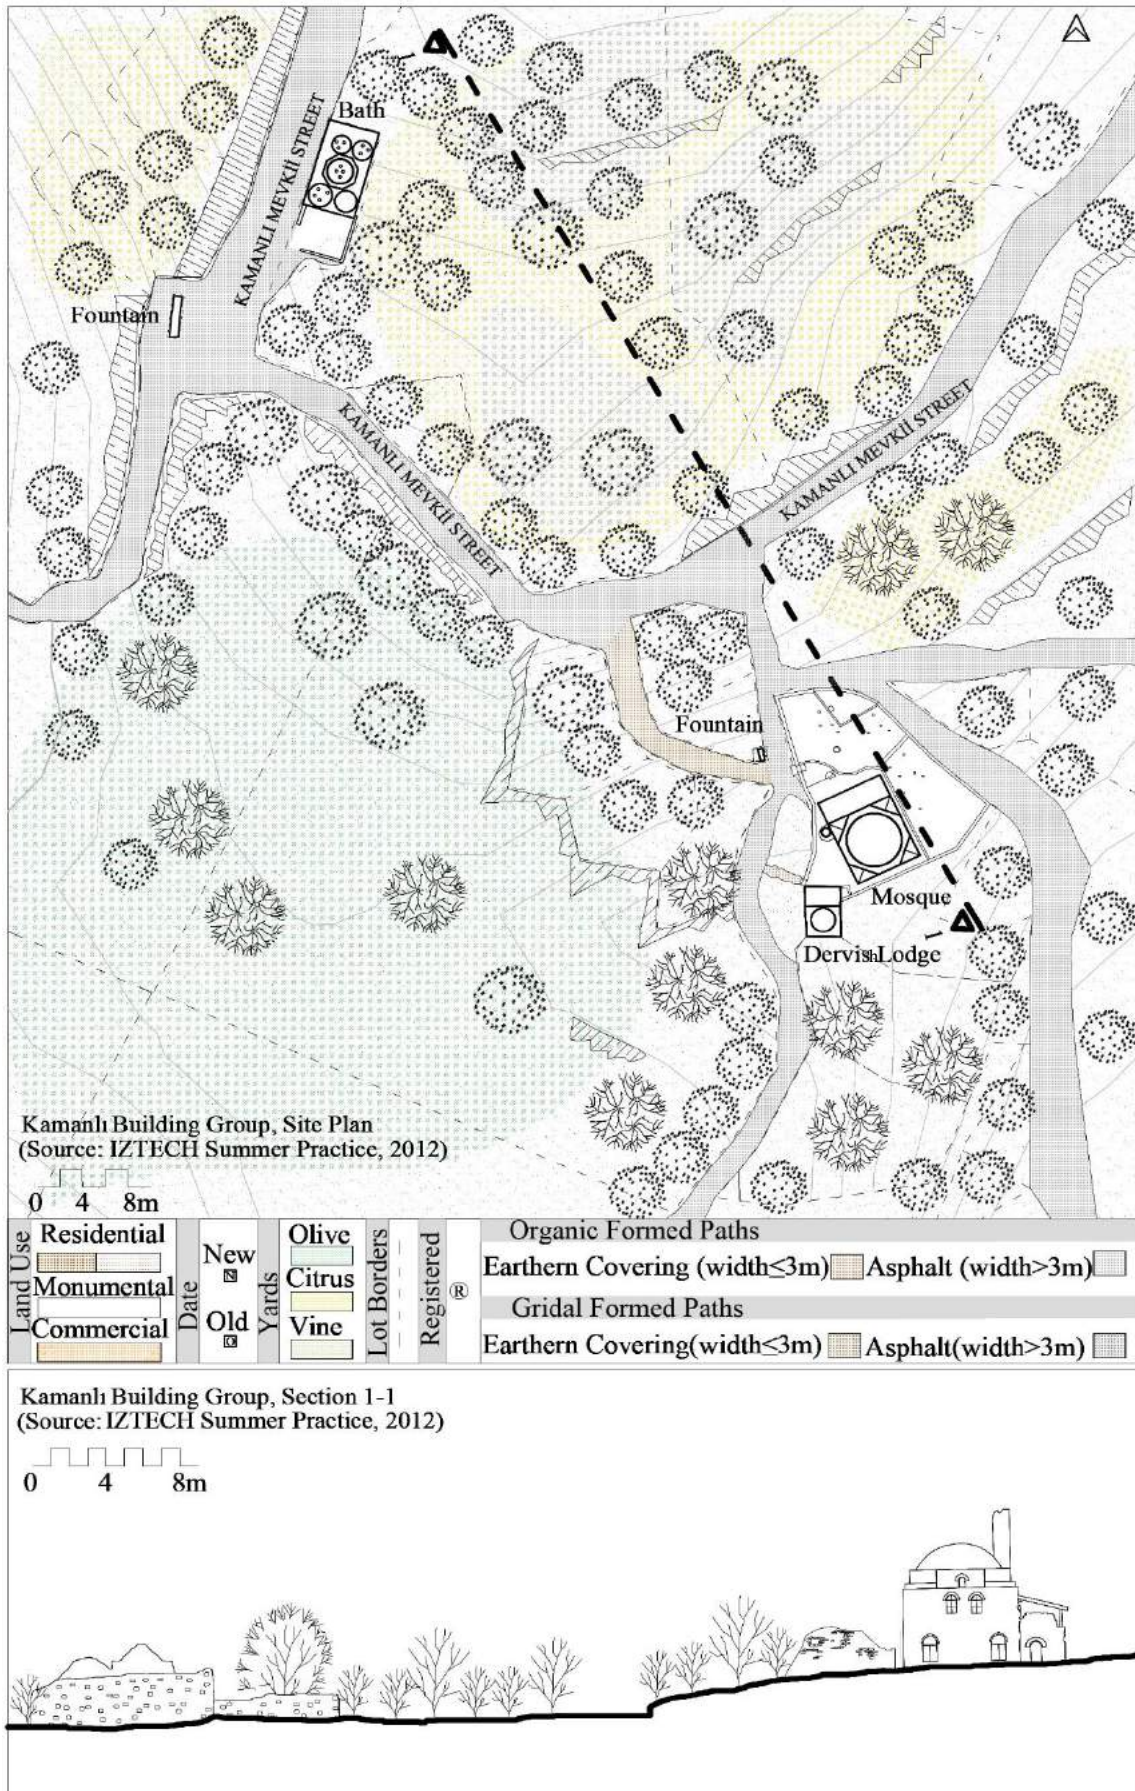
Site plan and silhouette section, Kamanlı Building Group
